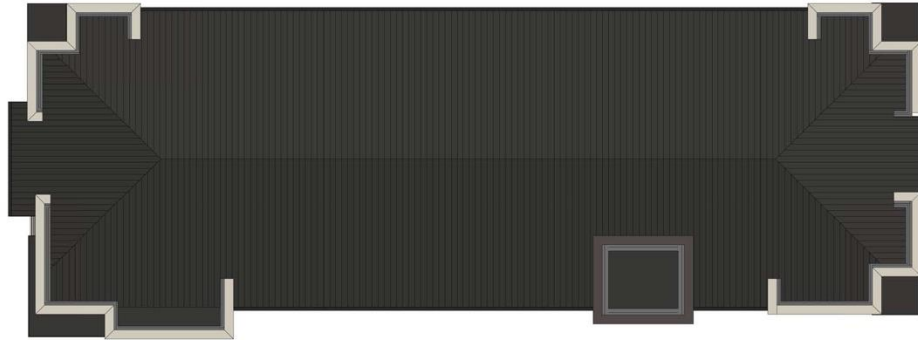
The roof plan of Building B04 (Ryman Drawing A1-010 RC22).
